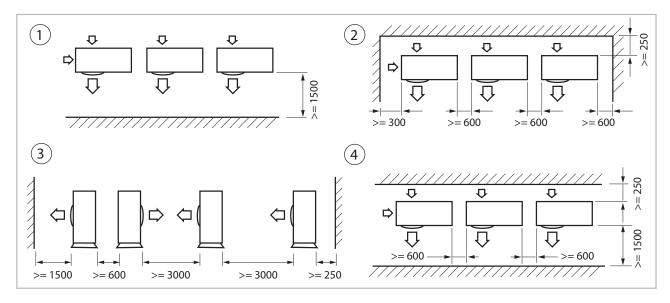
Minimum distances during construction of multiple outdoor units in mm
